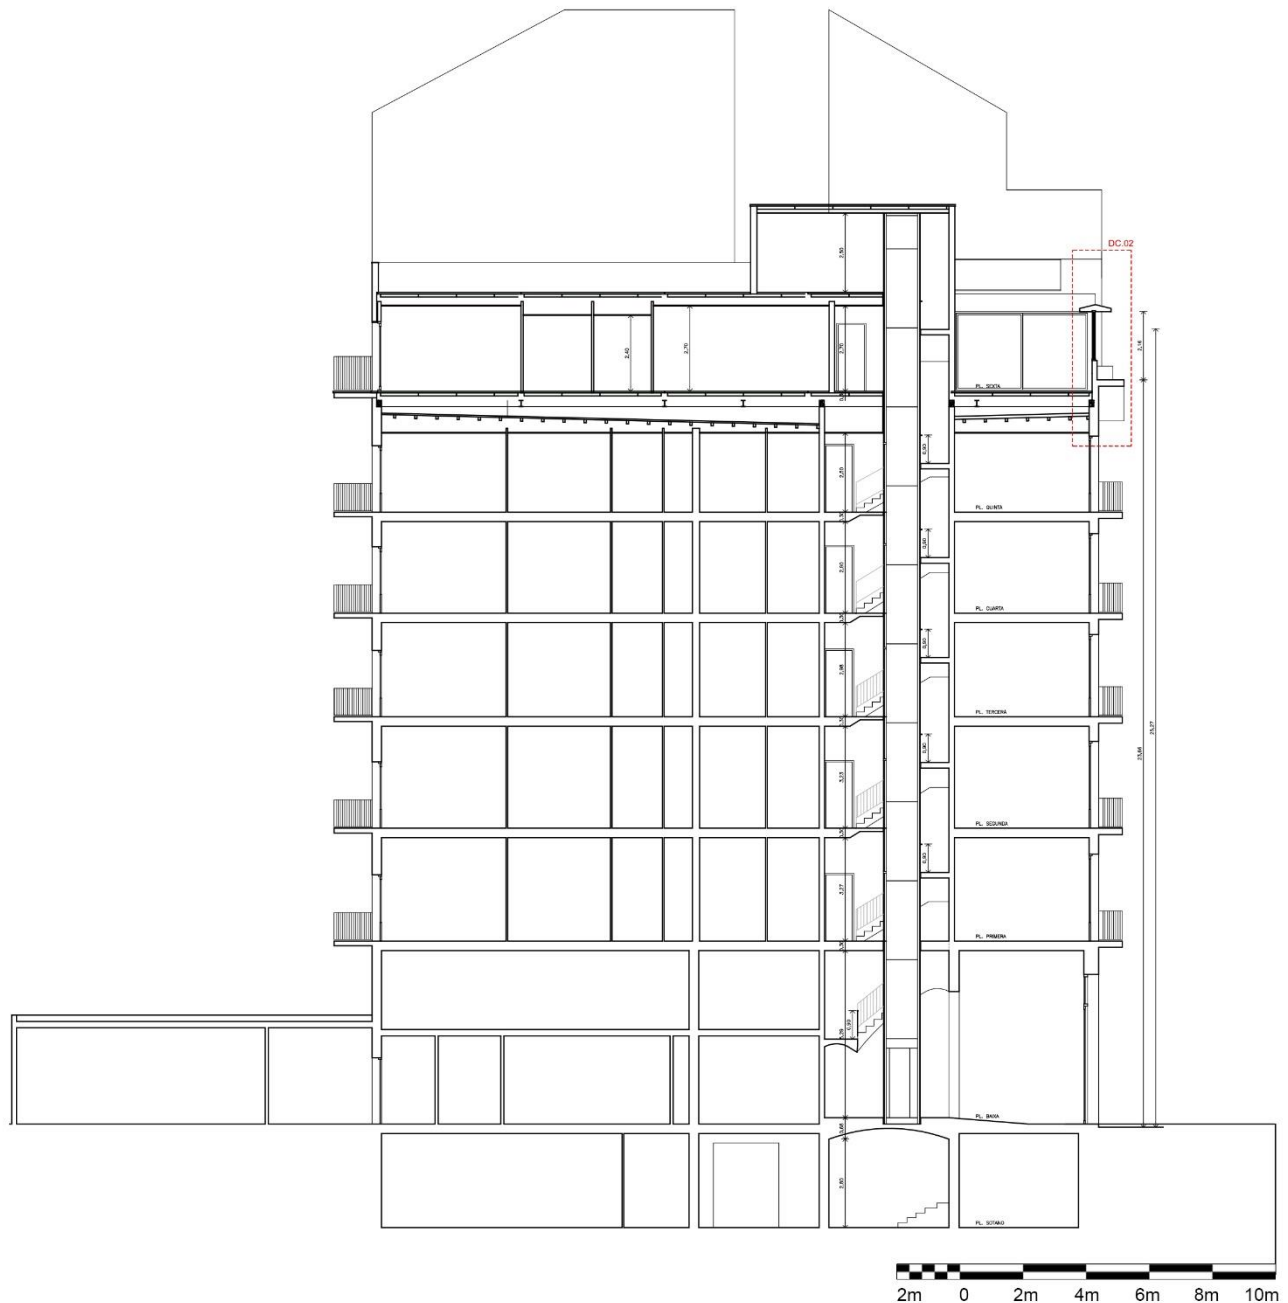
Cross section of the building including the added elevation See Figure 3.36 for the outlined-red detail of the connection between the existing building and the added module. Source: Garcia, Javier (Proyecto de Ejecucion Remonta e Incorporacion de Ascensor, Letamendi 29, 2014)
